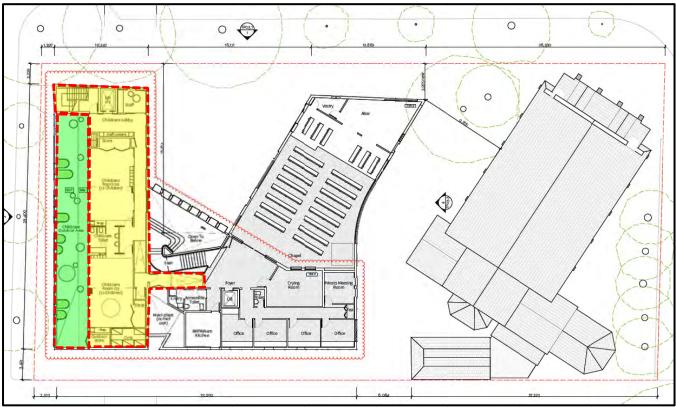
Excerpt from Drawing No. TP02.2 Proposed First Floor Level, with Child Care Centre use highlighted (yellow: indoor, green: outdoor)
